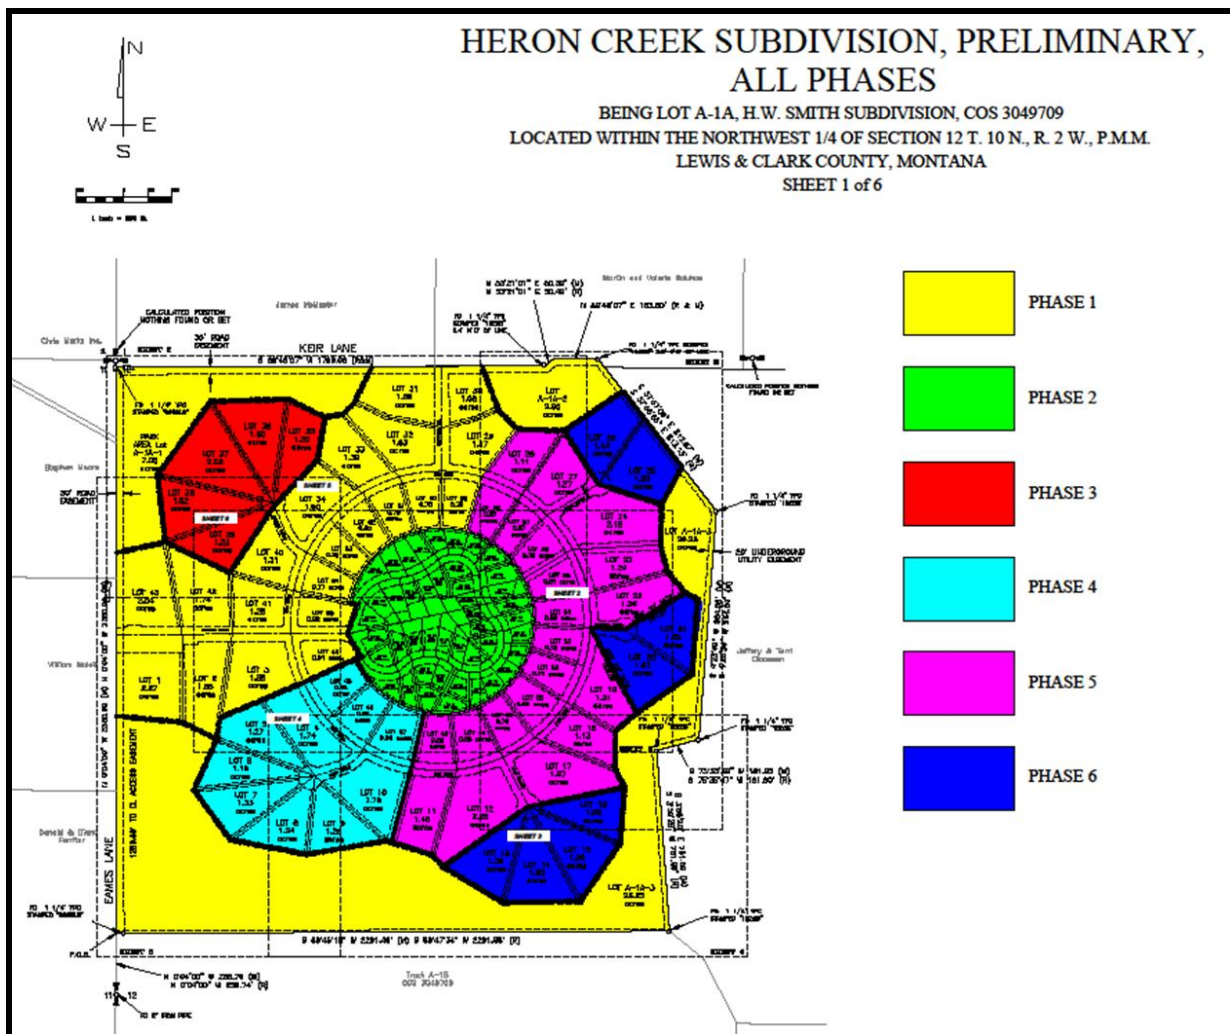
Current Preliminarily Approved Lot Layout and Phasing Plan
